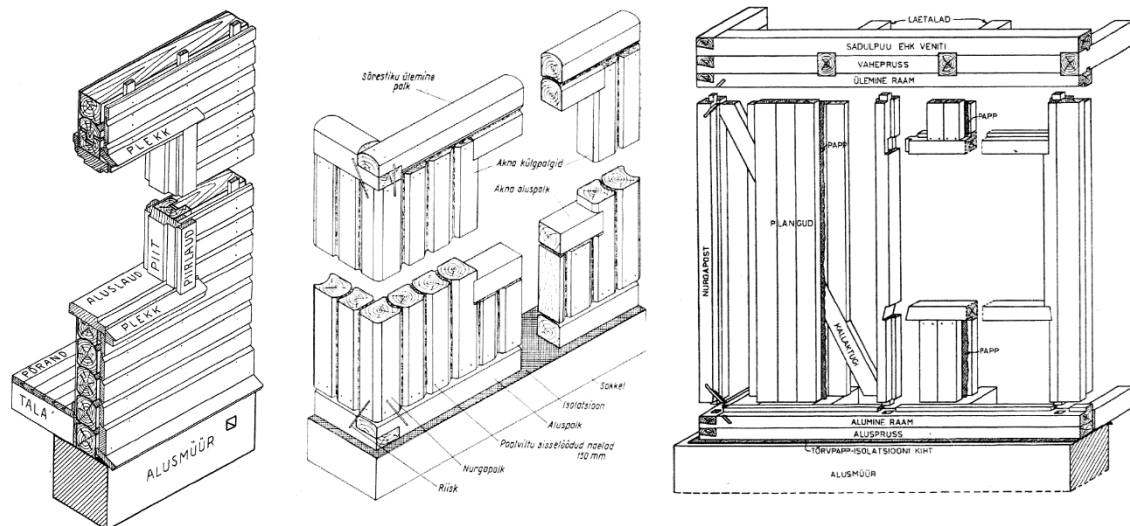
Examples of heavy timber structures (left to right: horizontal log (Masso, 2022), heavy timber frame with vertical log infill (Veski, 1969), heavy timber frame with double planking (Masso, 2022))
